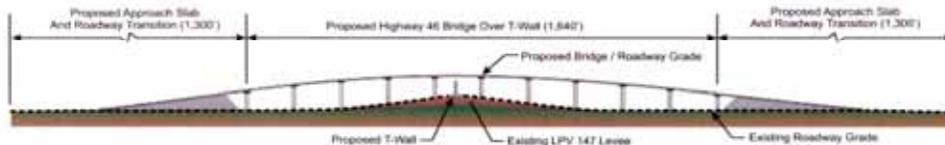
LPV 147 Proposed Action Highway 46 Bridge over T-wall
